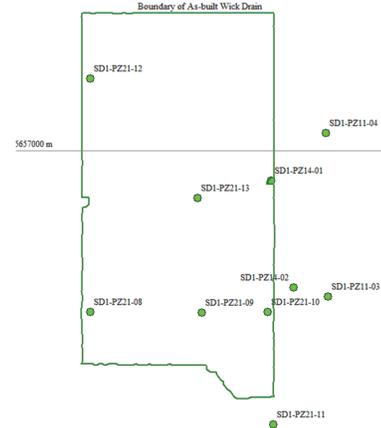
Location plan of piezometers installed in SD1 downstream and crest area
